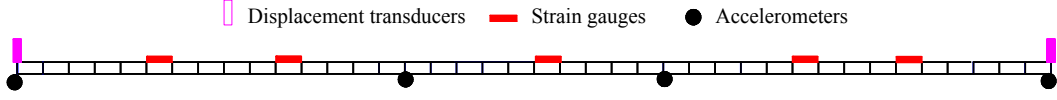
Sensor locations on the simply-supported overhanging beam
